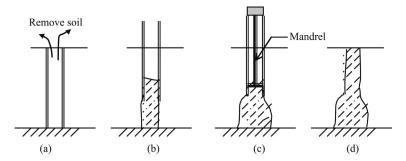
Compressed base type pile installation. (a) Insert a casing to the hard stratum and remove soil inside the casing. (b) Lift the casing and concrete. (c) Apply pressure using a hammer and an internal mandrel. (d) Concrete rest of the pile.
